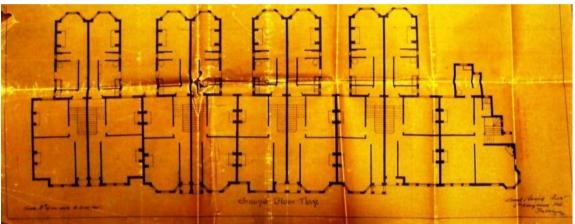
Floorplans of the same houses (Ibid., IV/83/1/5/1/23).
